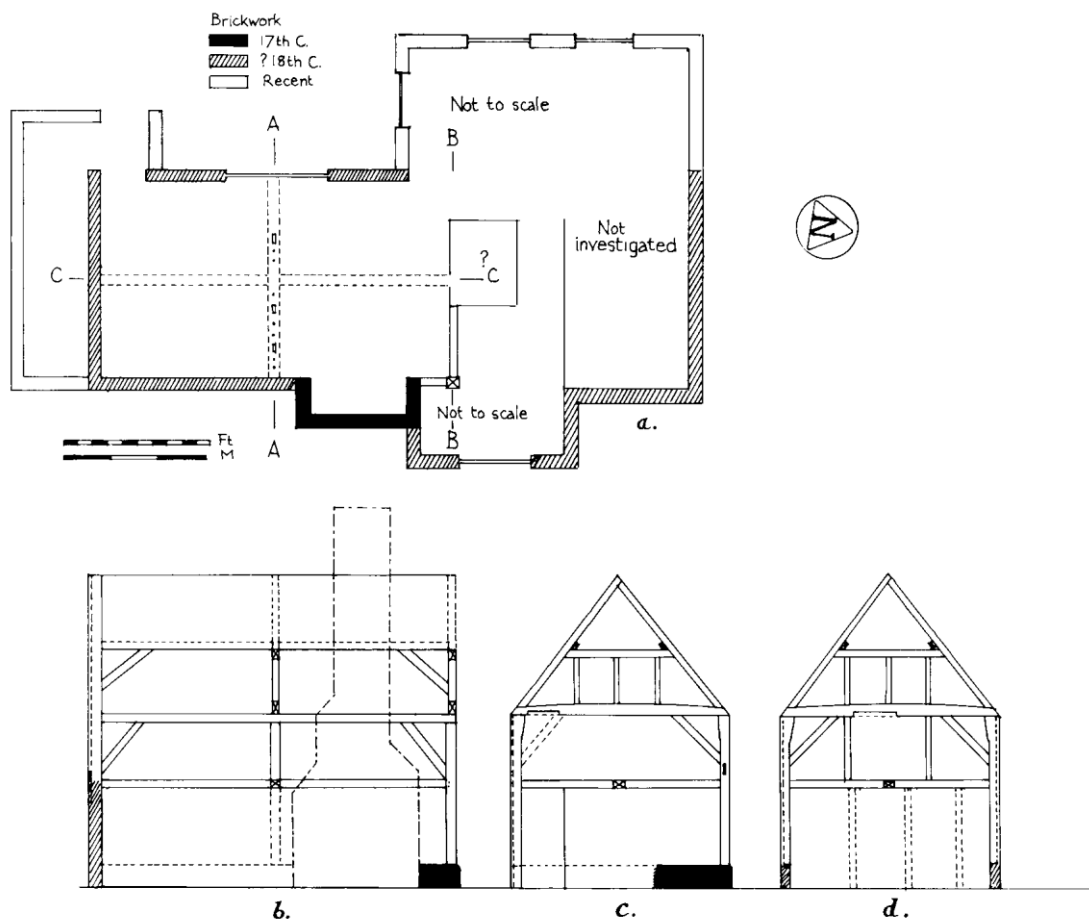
The Potter's Arms, (a) Ground floor plan: the original house is on the left, (b) Section at C-C. (c) Section at A-A. (d) Section at B-B.
